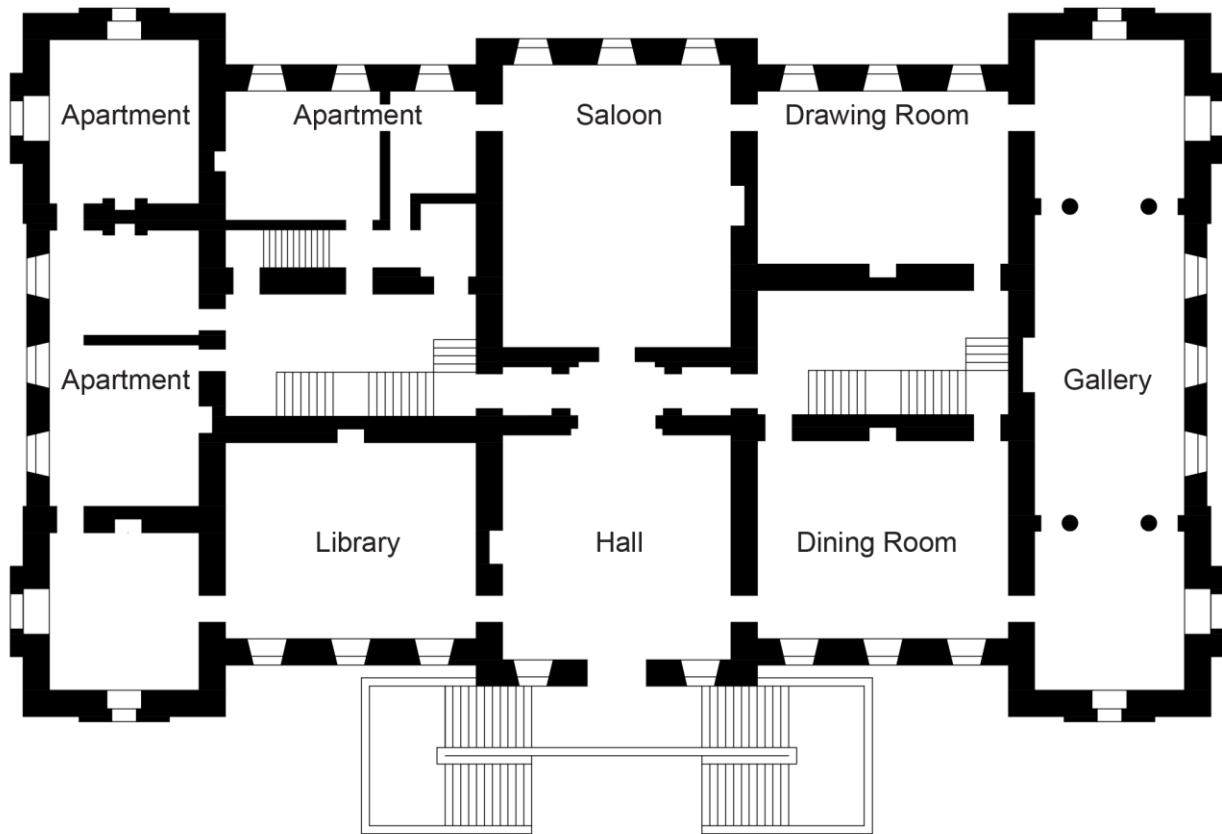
Sanderson Miller, Floor plan of the main floor of Hagley Hall, 1754-1760
